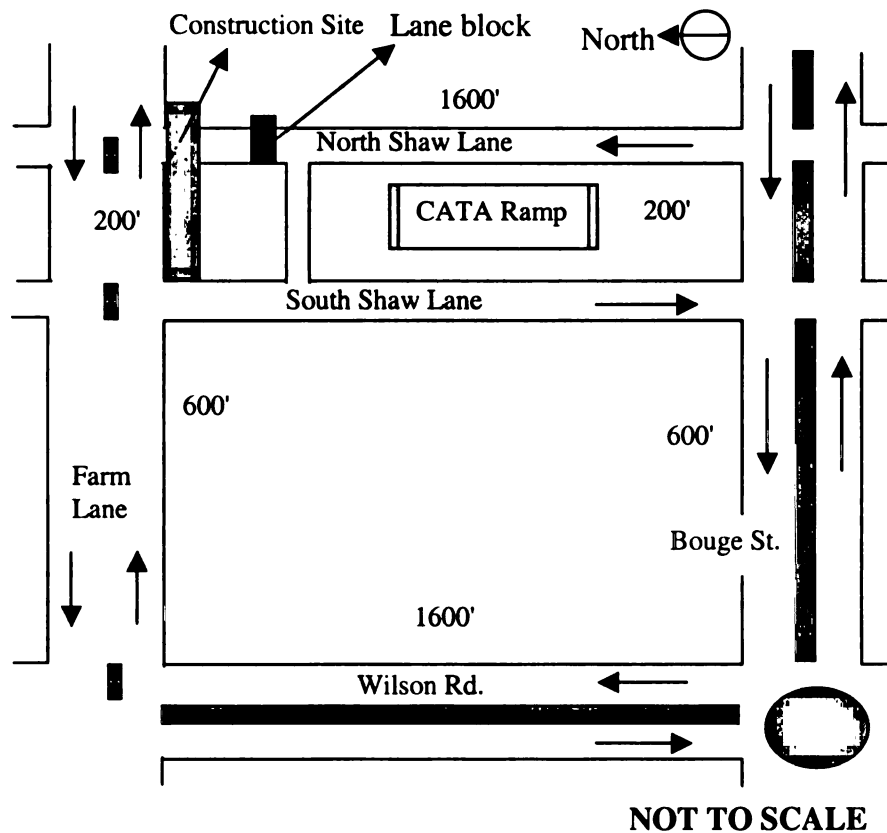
Detour Pattern and Dimensions in Using Open-Cut Methods, MSU
